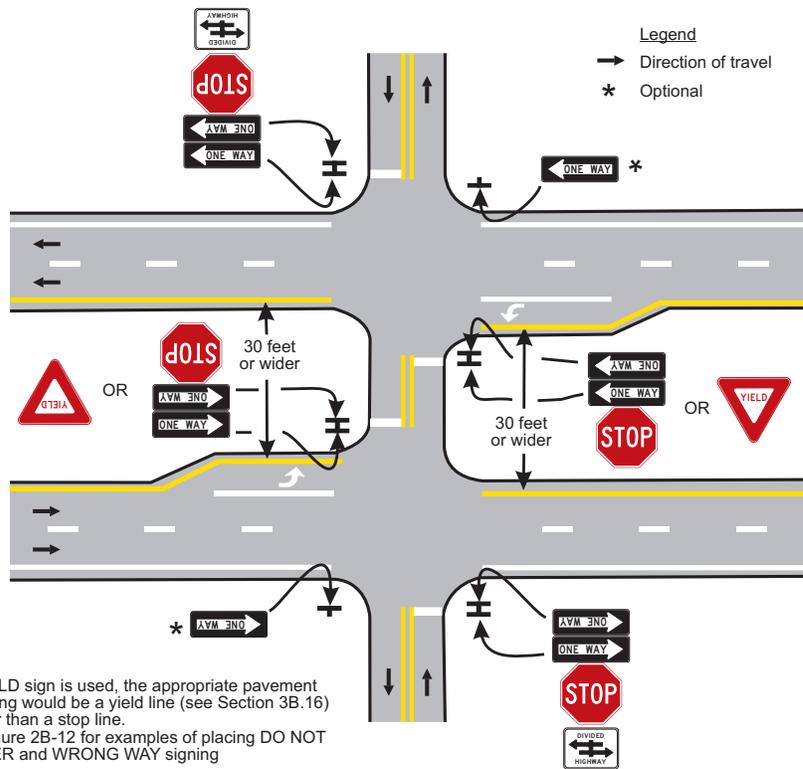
B-15. ONE WAY Signing for Divided Highways with Median Widths of 30 Feet or Wider
